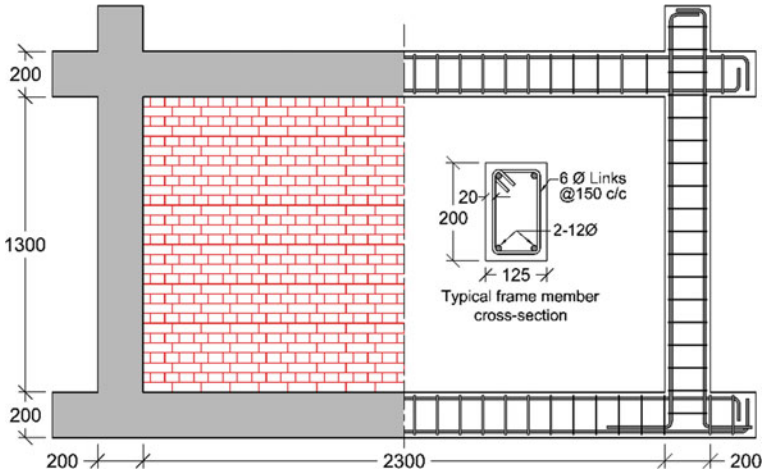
Geometric and reinforcement details of the test specimen (all dimensions are in mm)
